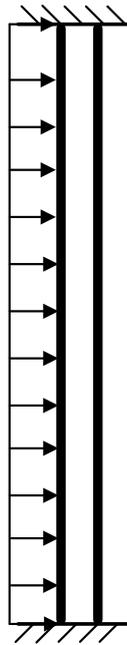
Free Body Diagram (FBD) of Column Subjected to Blast Load
